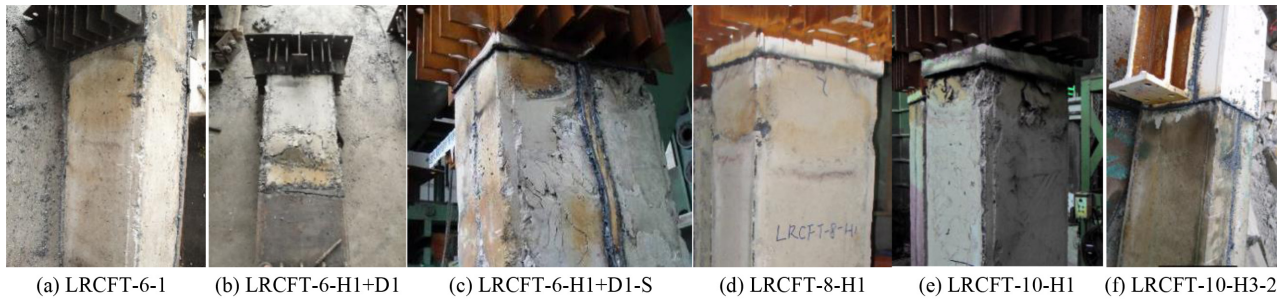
Failure Modes of Core Concrete of Typical Specimens.
